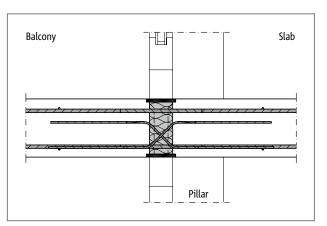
Schöck Isokorb® T type D: Installation section; flat slab
